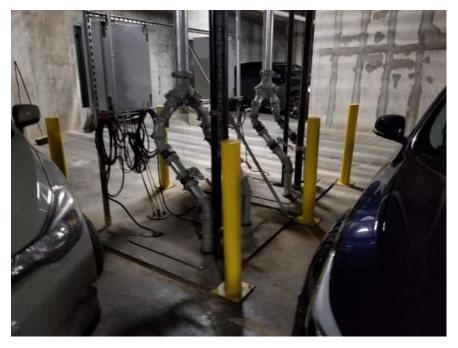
General view of the reinforced concrete slab within the cellar level ventilated parking garage (03/29/2021)
